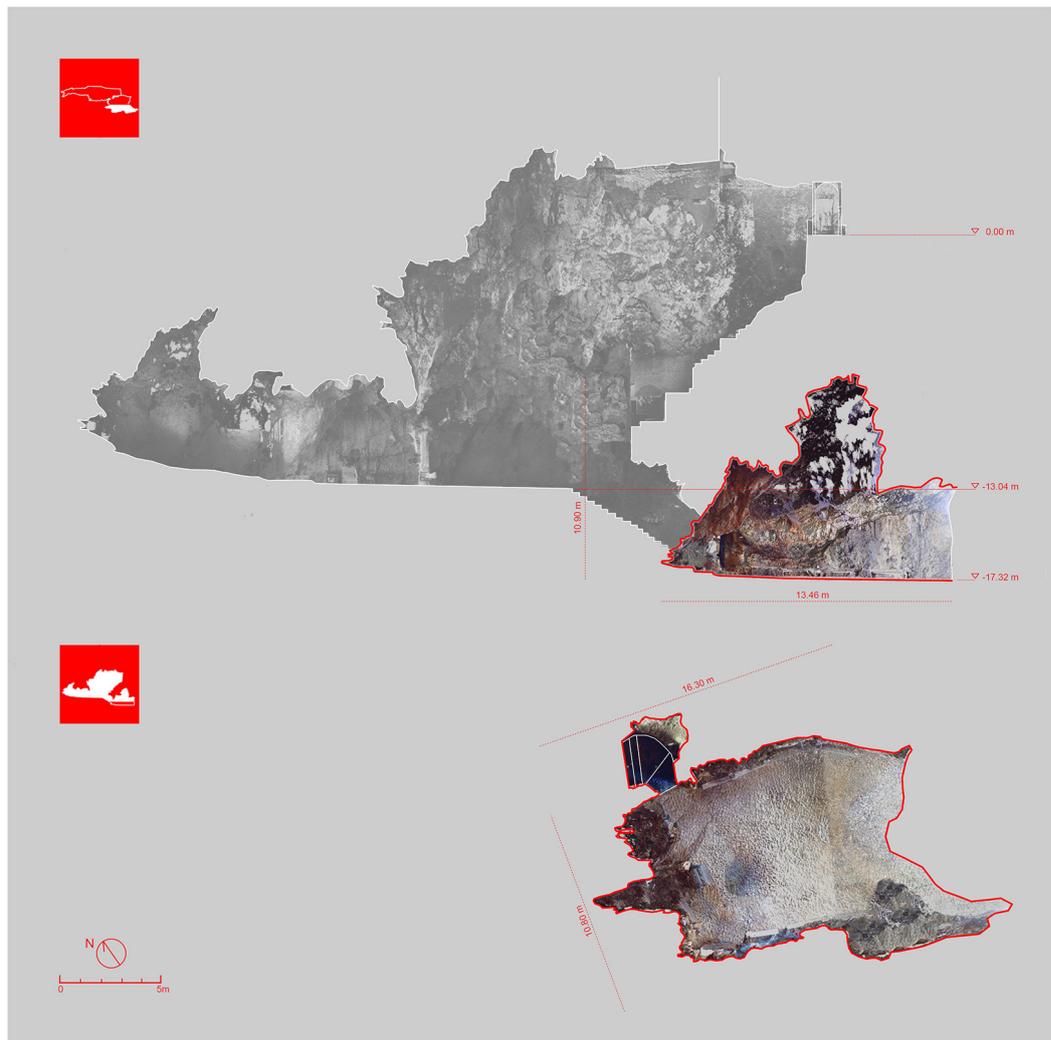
Hermitage of Santa Maria della Stella, Pazzano. Longitudinal section of the cave on the lower level. Plan at -15.50 m (bottom). Graphic elaboration by Placido Pellicano.
